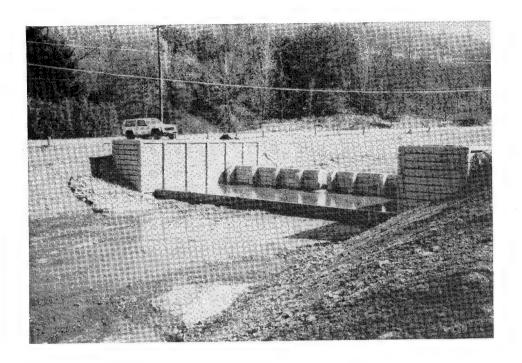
Precast concrete checkdams, Chauncey Run, NY (from Allen 1991)
